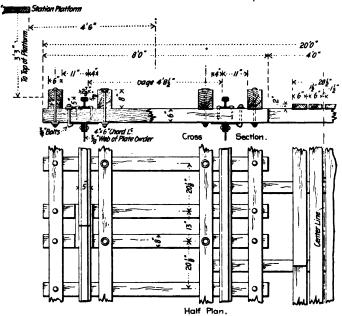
Track Construction of the Chicago & South Side Elevated Ry.
